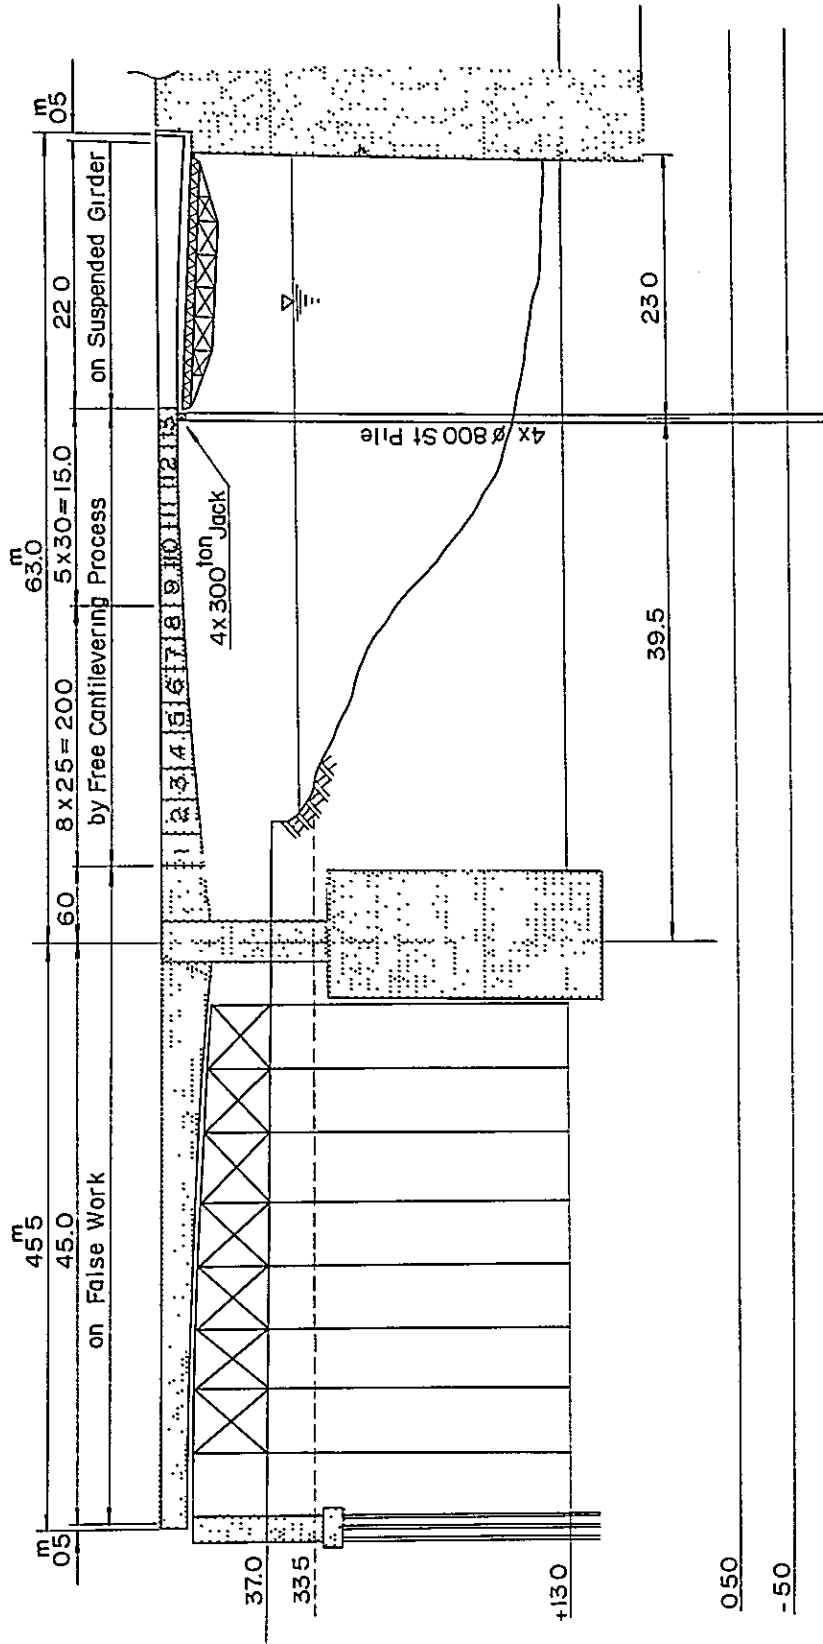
GIRDER ERECTION FOR APPROACH SPAN
